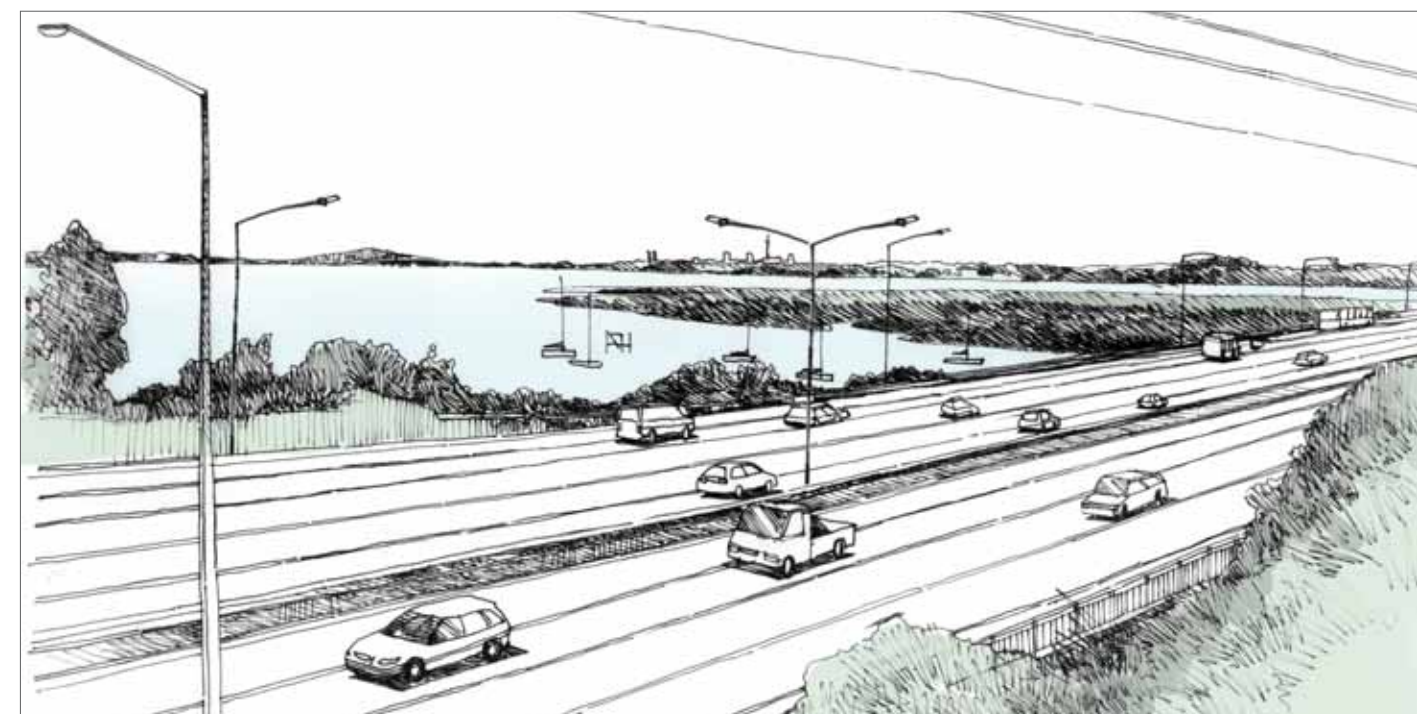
Concept sketch of proposed view from southwest of Whau bridge (View 2)
